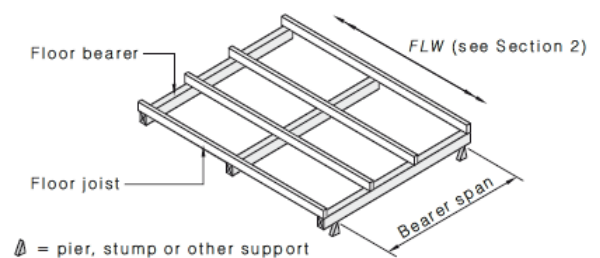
FLOOR LOAD WIDTH (FLW)—SINGLE- OR UPPER-STOREY CONSTRUCTION
